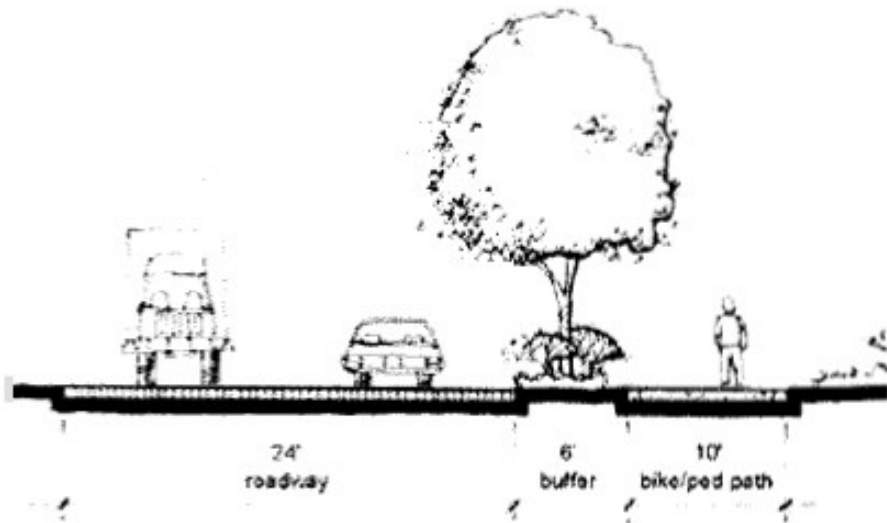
of City of Manzanita Downtown Transportation Plan, Classic Street Cross Section
